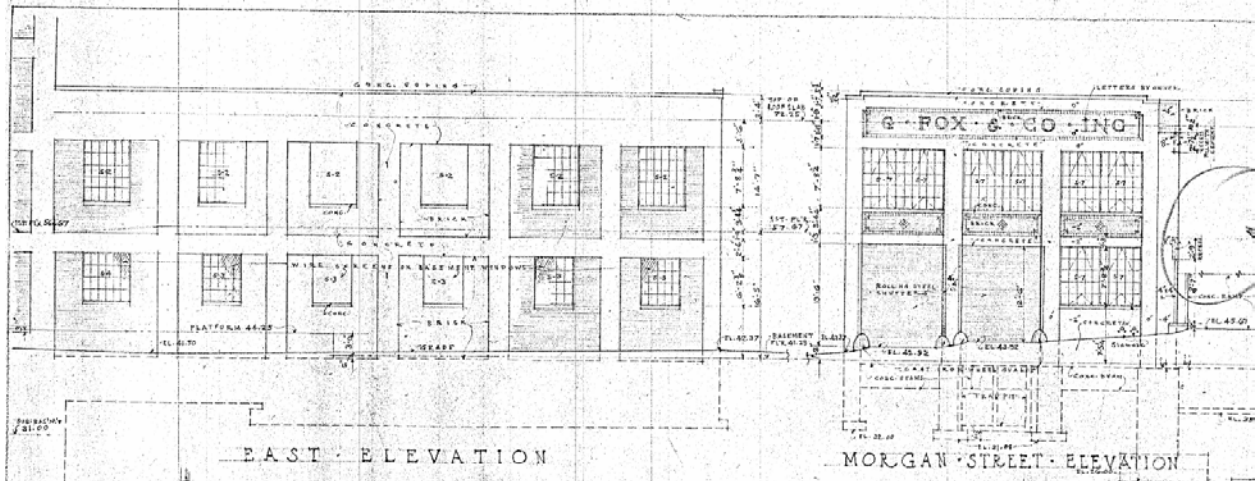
Elevations from “Revised Plans - Morgan Street Extension - G. Fox & Co. Inc. Hartford, Conn.” By Abbot Merkt & Co. Inc. Engineers & Architects, 175 Fifth Ave, New York, May 20, 1930. Stamped “Received” by the Building Department July 1930. Seven pages of drawings, found in the Hartford GIS scanned document viewer under the address 36 Talcott Street, depict the architectural, structural, and utility plans for the 1930 addition on the north side of the original structure. This portion of the structure is not included in the district and none of the signage or original windows remain.
